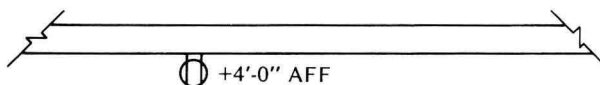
Method of showing mounting height of a few switches on working drawings.
